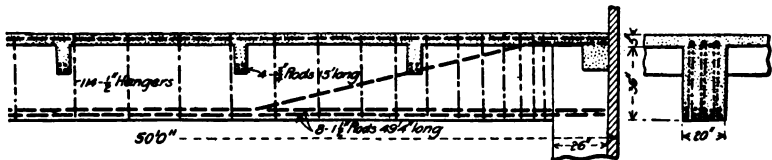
Section of Main Girder in Robbins Garage, New York City.
